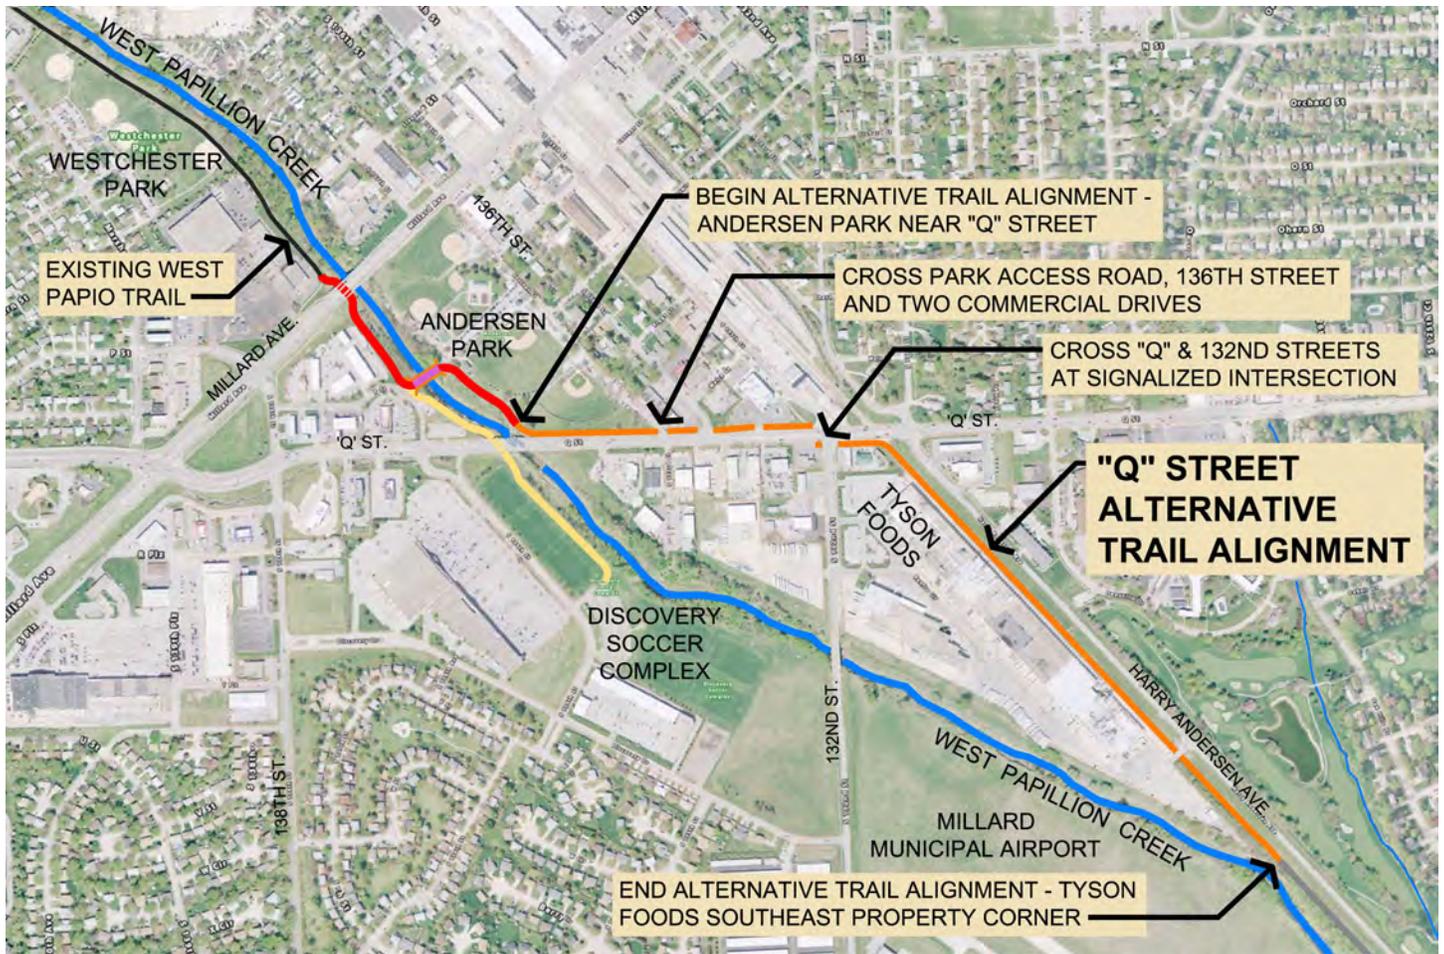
Millard Avenue to Southeast Property Corner of Tyson Foods, Alternate Alignment
